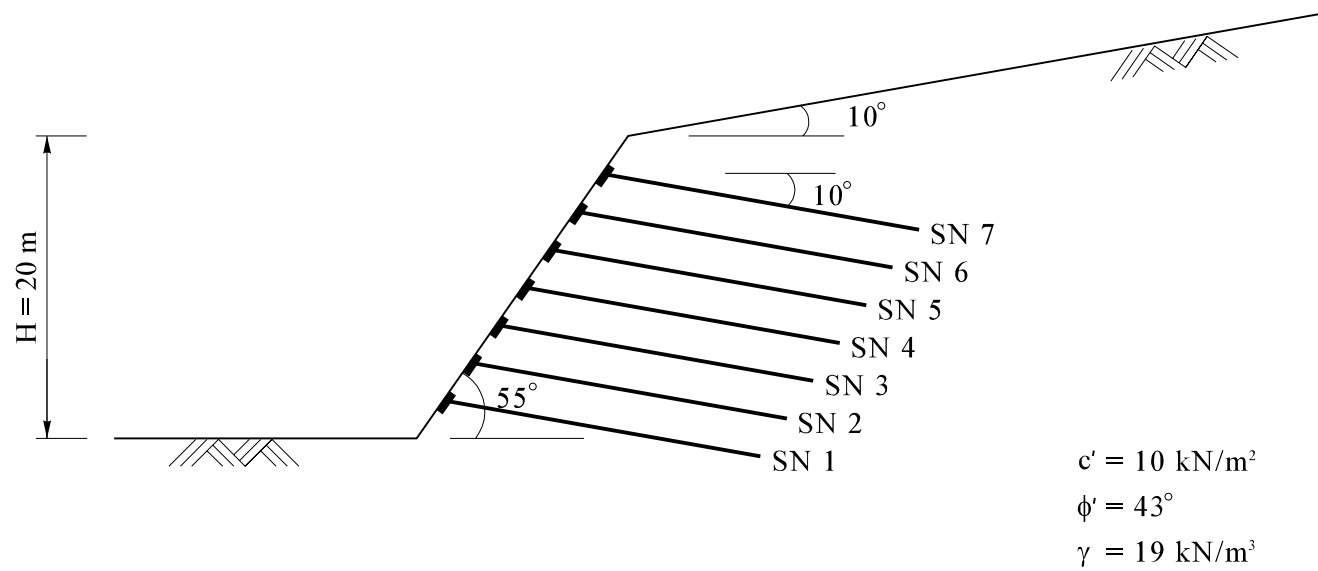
Geometry and Material Parameters of Model Nailed Slope
